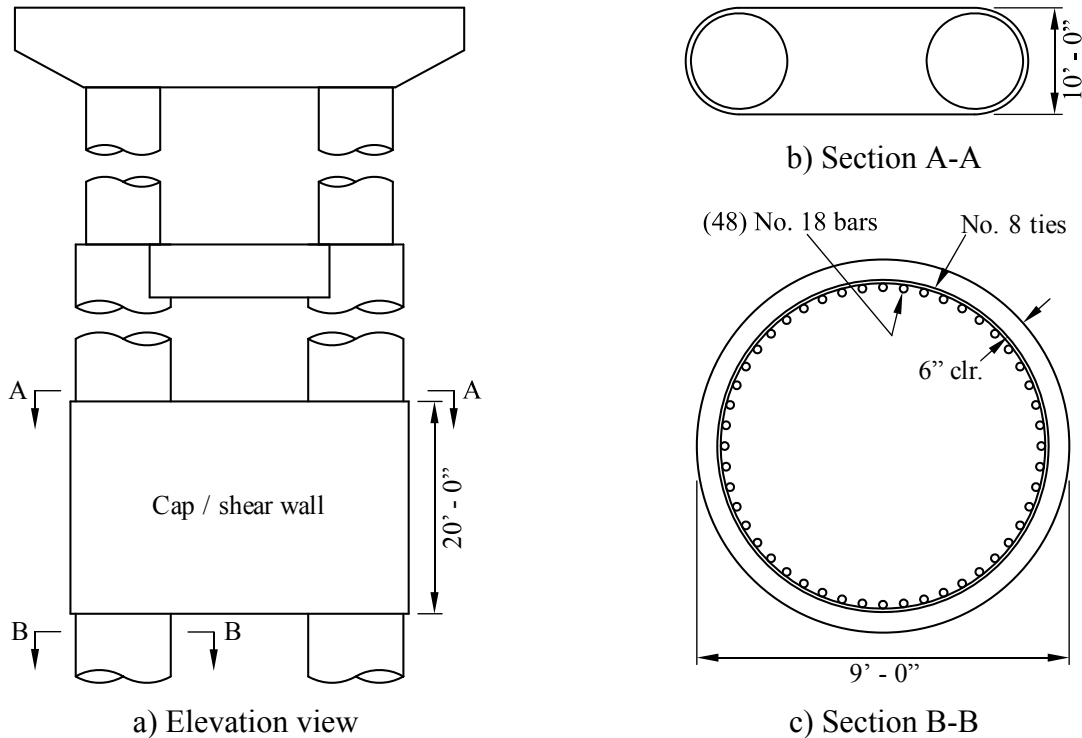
LA-1 Bridge alternative design with drilled shaft foundation: piers 2 – 4
